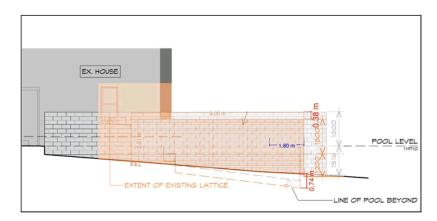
Overlay of Amended plans on Advertised plans (Prime Design, 2022)
